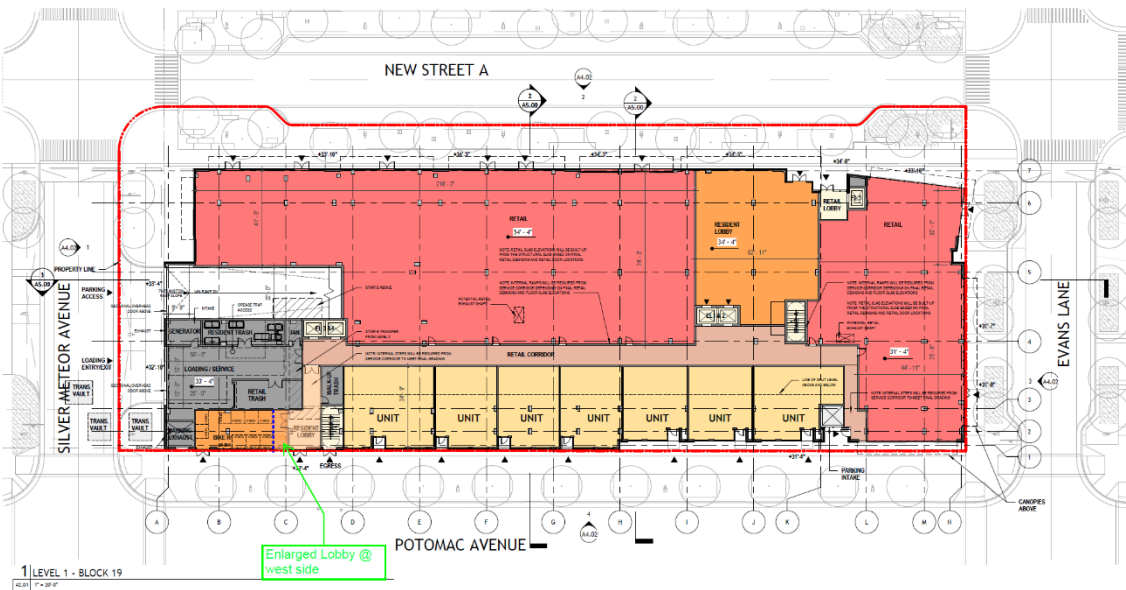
Revised Ground-Floor Lobby for Building #19 with Enlarged Secondary Lobby on Potomac Avenue
